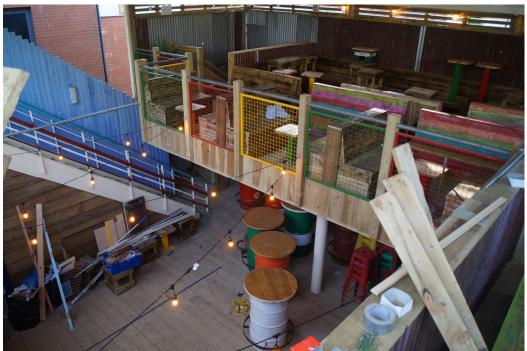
A view into the mezzanine floor from the existing roof terrace. Looking southeast.
